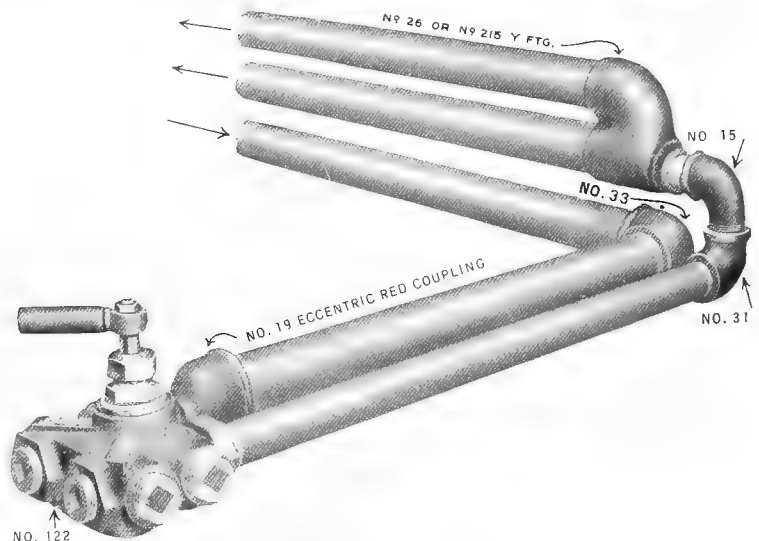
One Method of Connecting a Three-Pipe Coil Feeding at the End.
